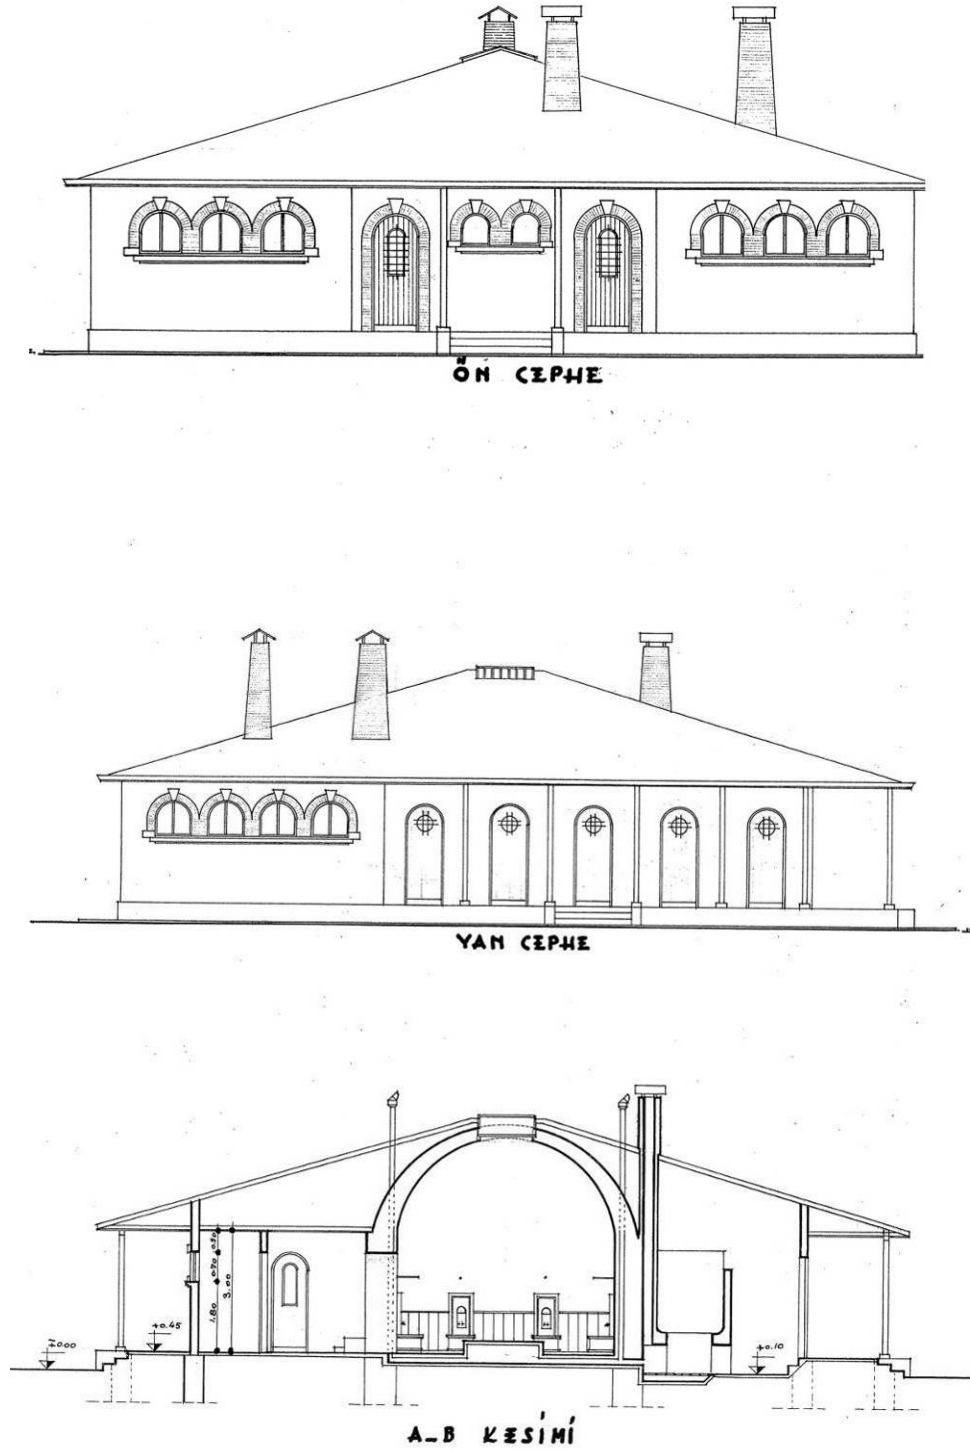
Facade and section drawings of the Hamam in beer factory (TTA archive)
